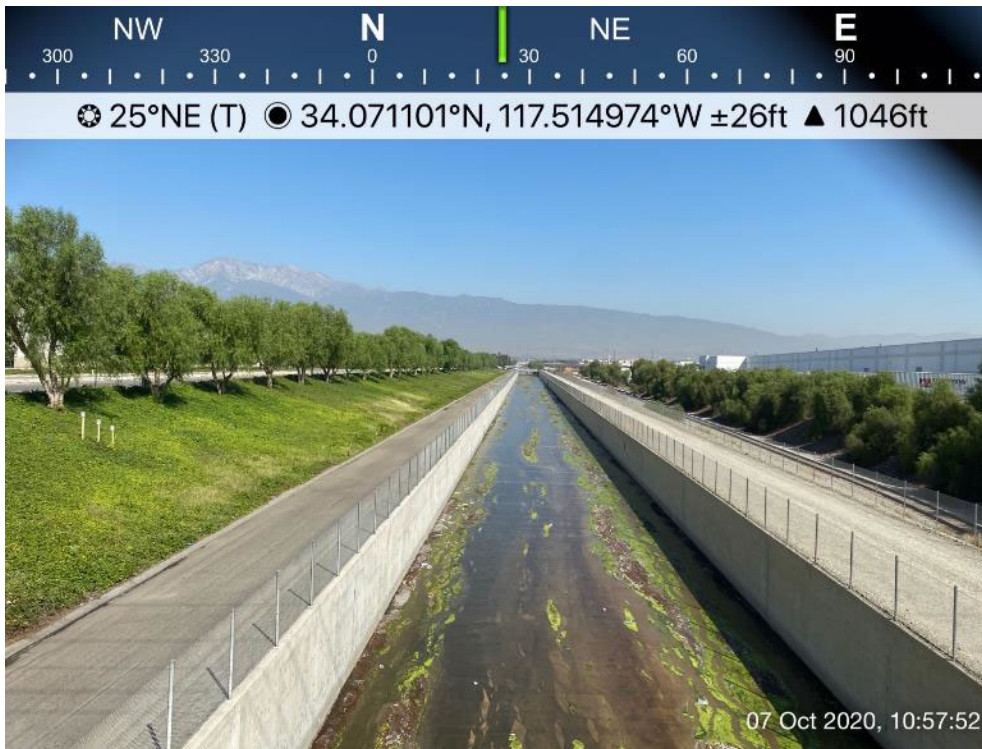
View of unnamed Drainage looking east (upstream) north of SR 210.
